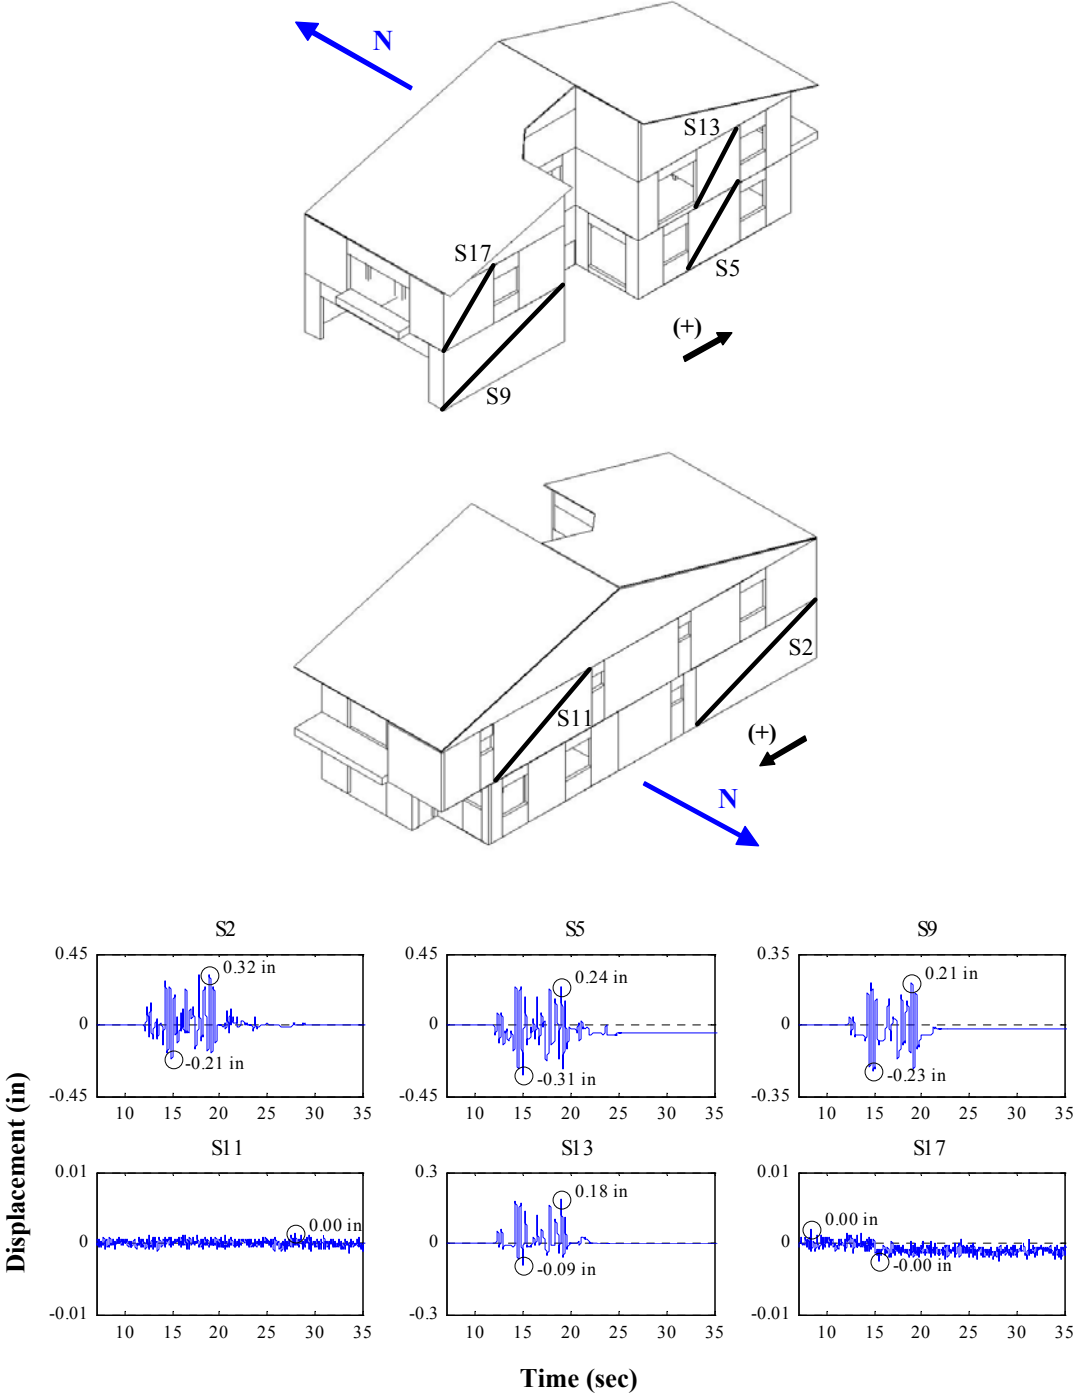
Wall deformations of east-west external walls for Test NWP1S10
